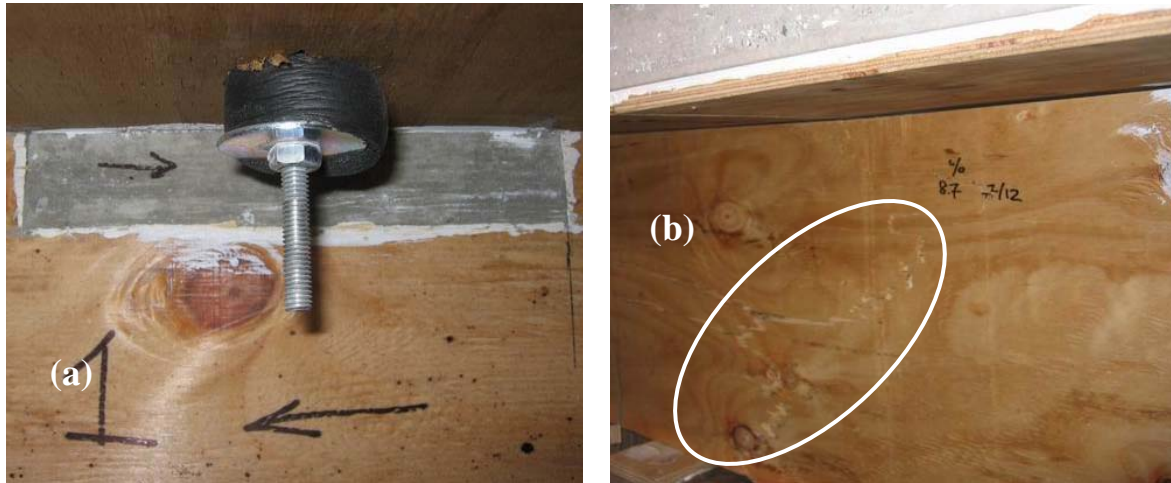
Beam B1: (a) no sign of failure in connections; (b) sudden bending tension failure in LVL at one third span
